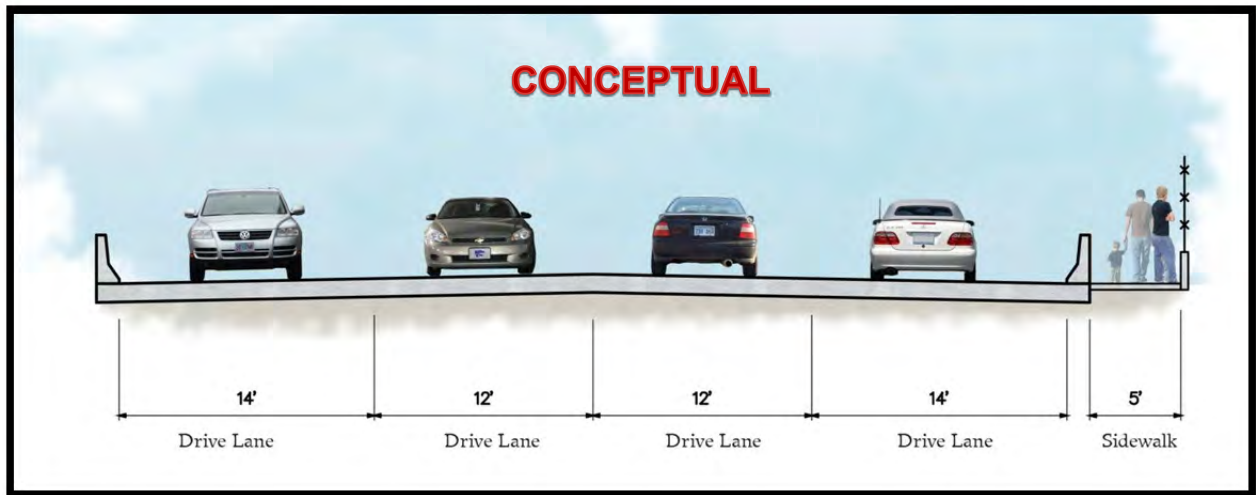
Bridge over Interstate 44 – Option A Potential Cross-Section
